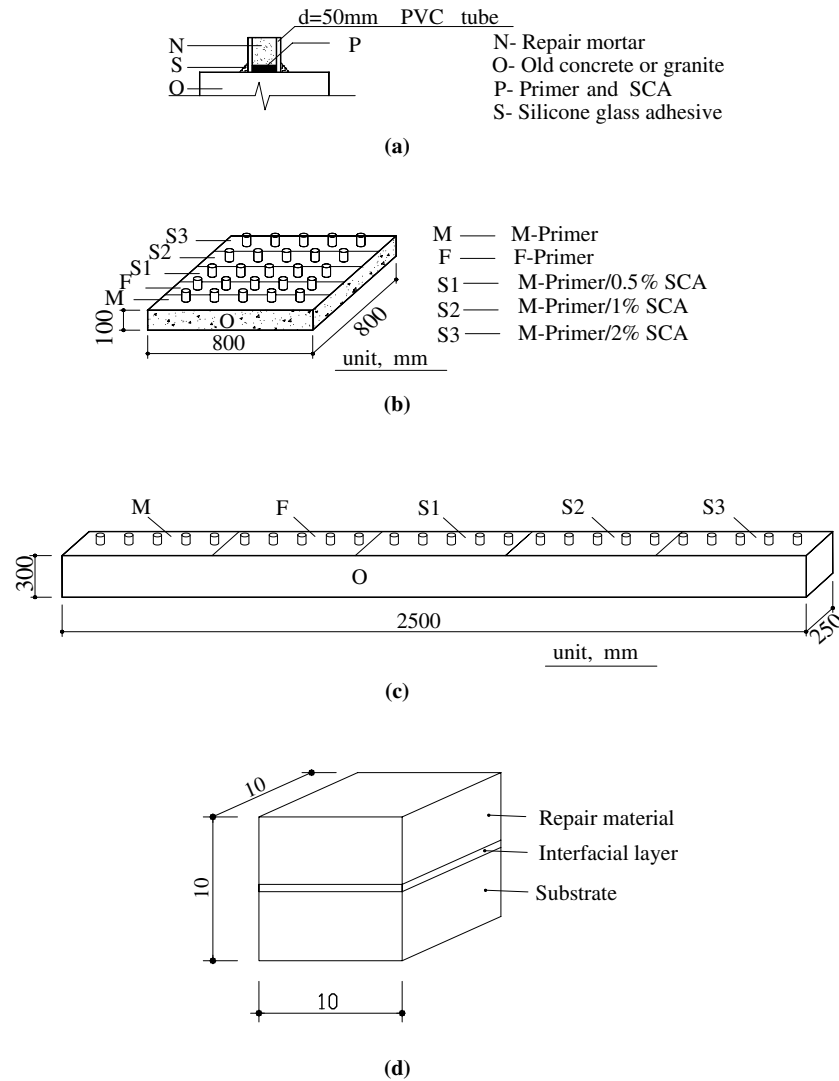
Specimens for pull-off bond test and microstructure observation: (a) repair procedure; (b) granite plank specimen; (c) concrete beam specimen (d) sample for SEM observation.
